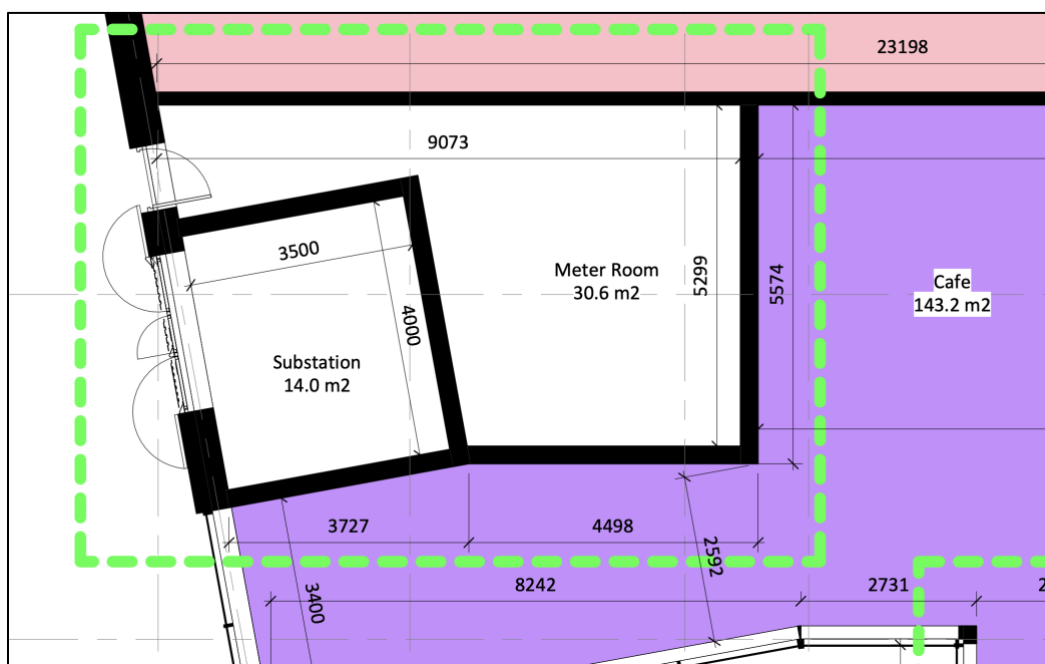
Extract from Drawing ‘Block 01-First Floor Plan – Proposed’, Drawing No. ‘19016A-OMP-B1-01-DR-A-1101, showing the proposed relocation of the substation and meter room adjoining the café unit, prepared by O’Mahony Pike Architects.
